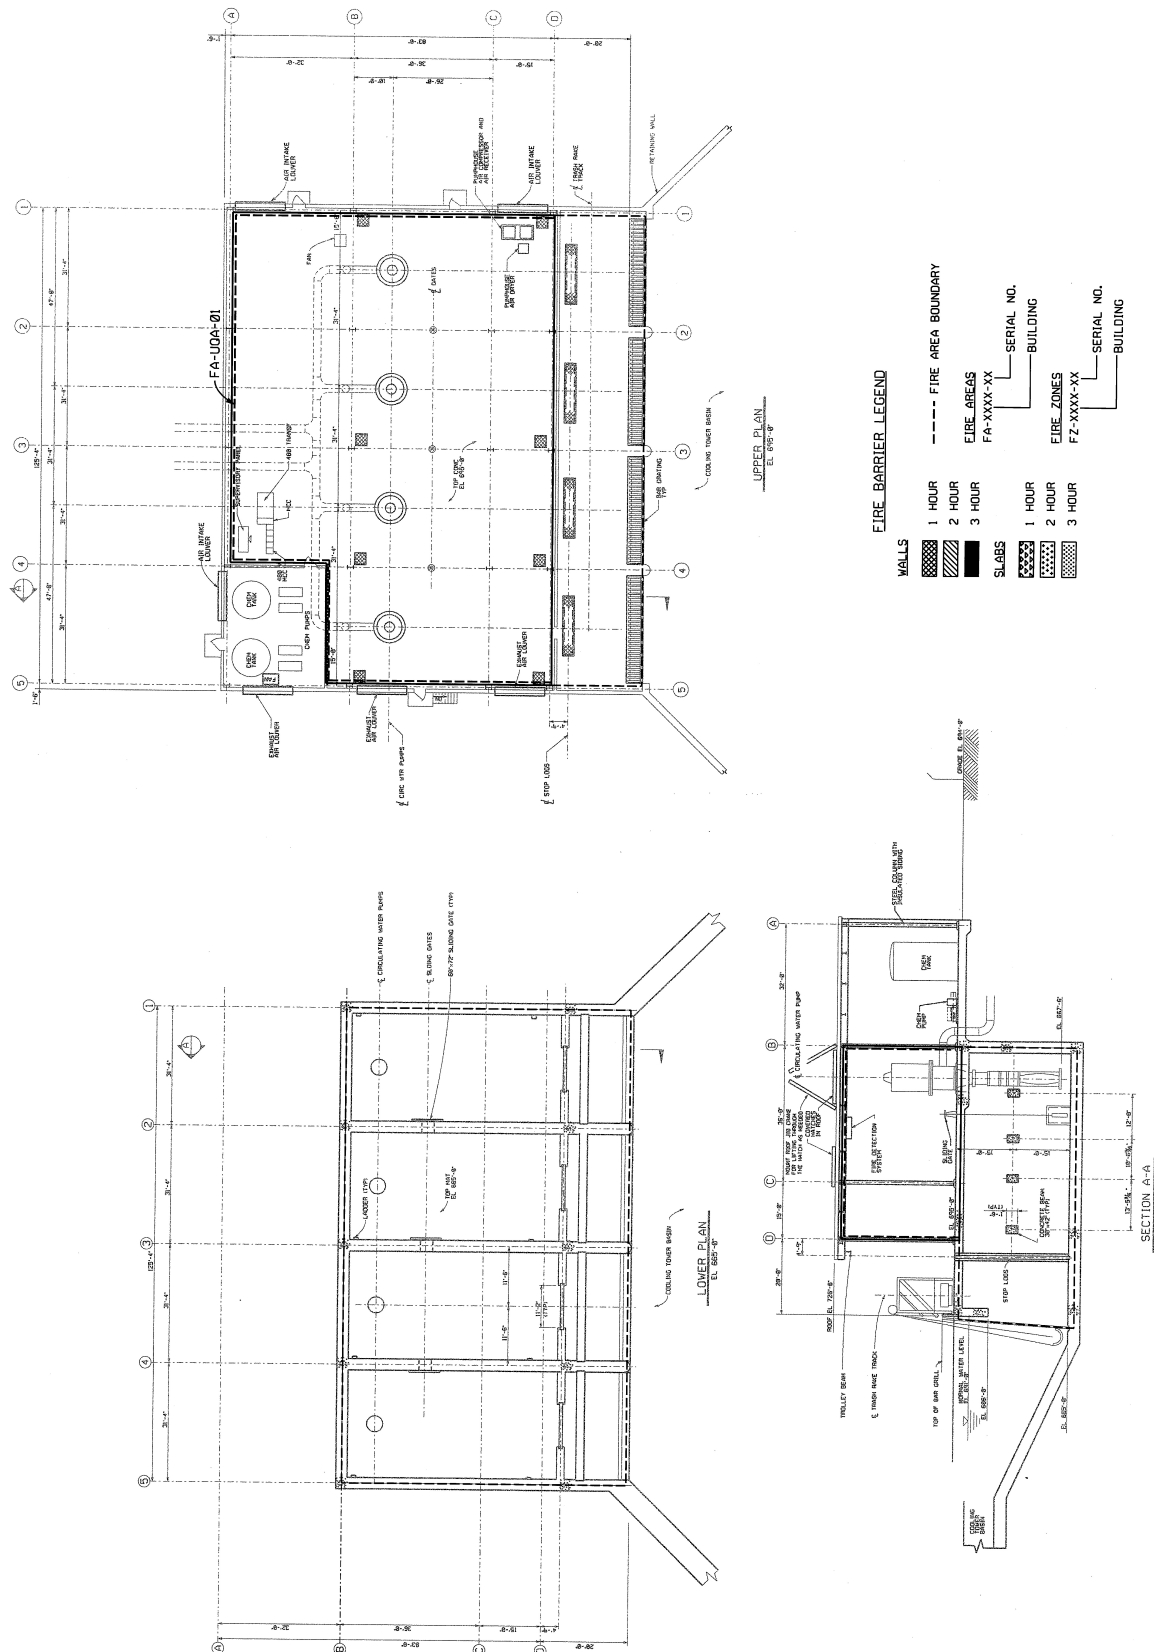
B-23— {Fire Barrier Location, ESWEMS Ground Floor and Mezzanine Plan}
